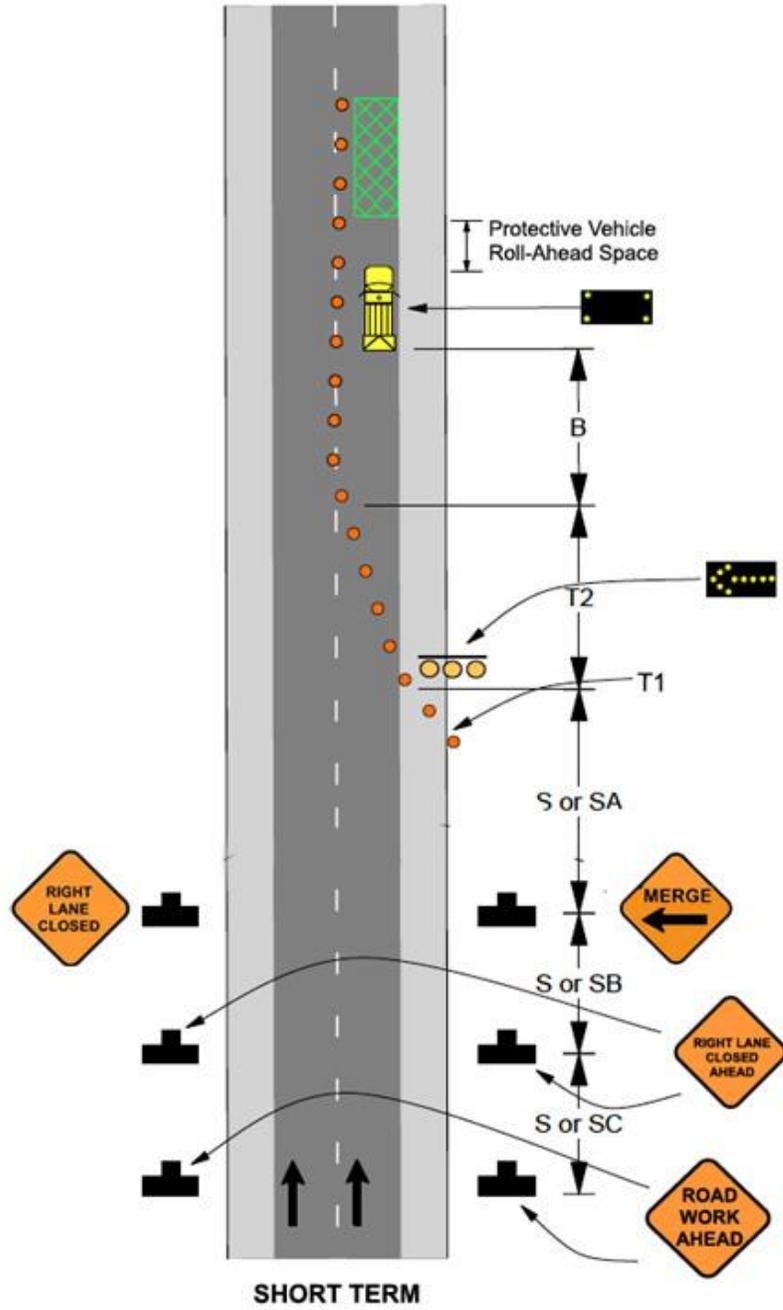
Test merge sign temporary traffic control plan for a stationary lane closure on a divided highway
